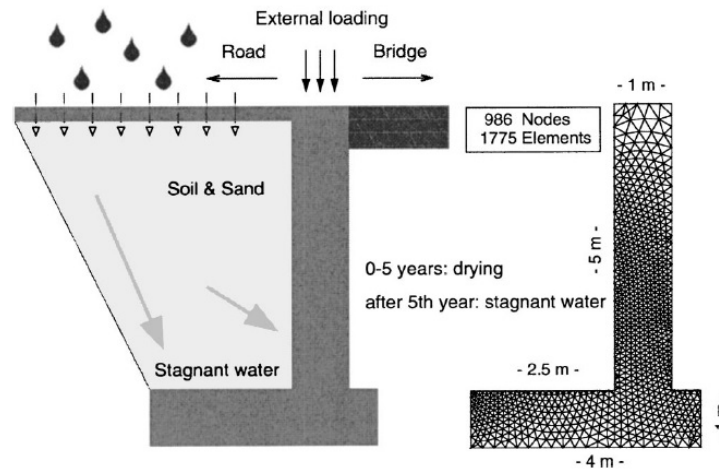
Reactive concrete retaining wall and its finite element mesh; Steffens, Li, and Coussy (2003)
